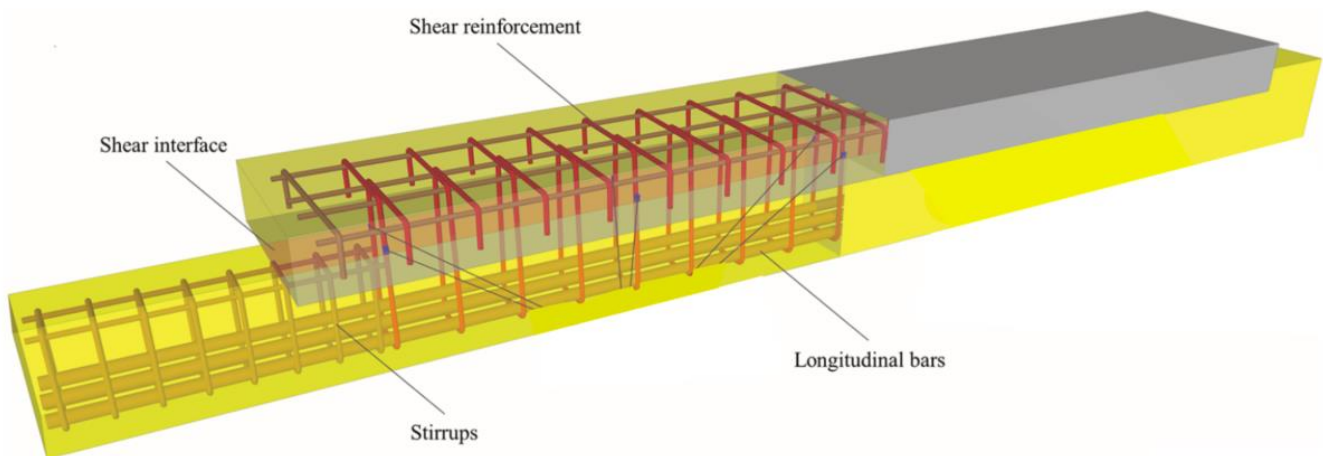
Typical detail of a T shape composite concrete beam cast in two stages at different times.
